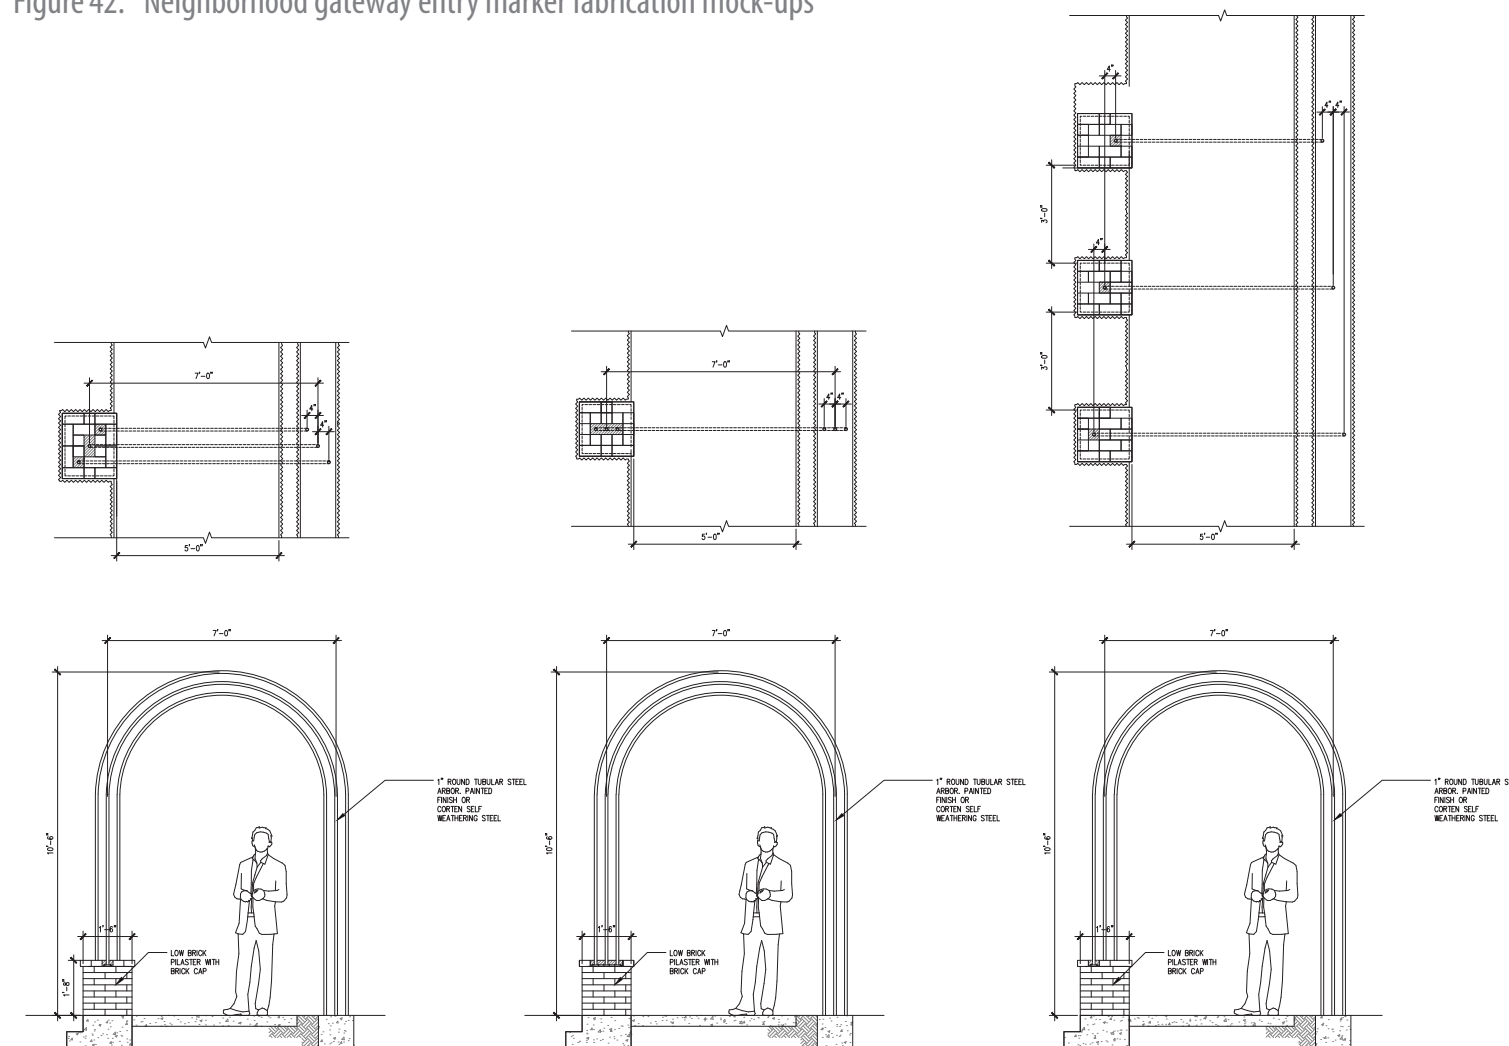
Neighborhood gateway entry marker plans and elevation alternatives
